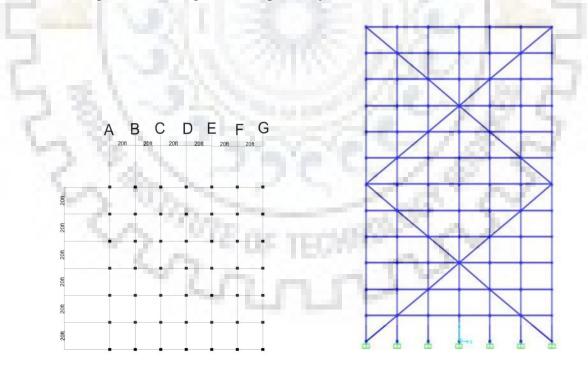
Plan of mid-rise multistorey Xbraced frame
